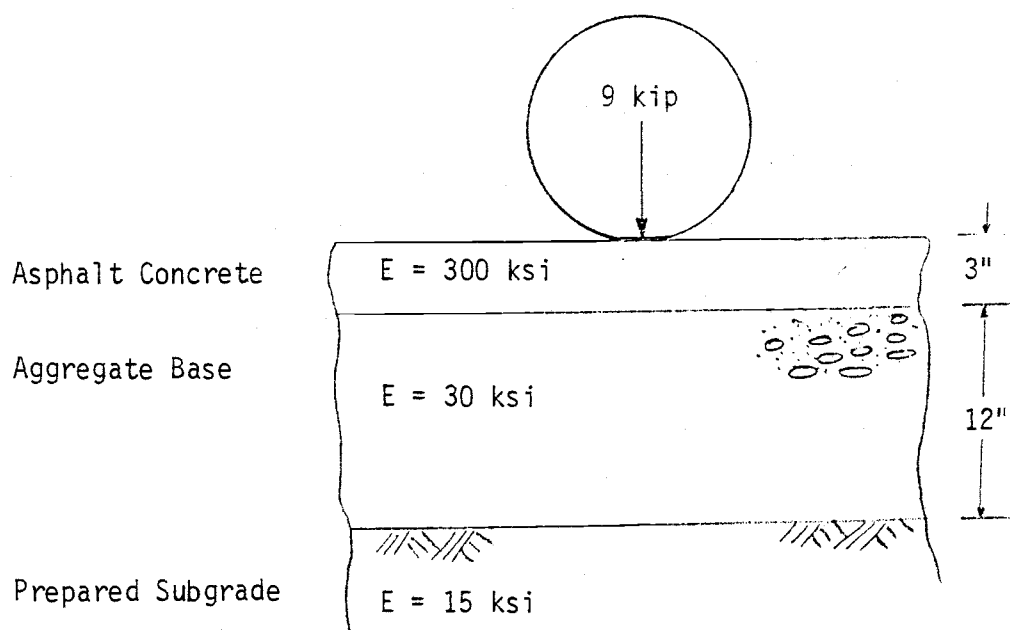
Road Section Used in Calculating Stress Conditions to use for Permanent Deformation
